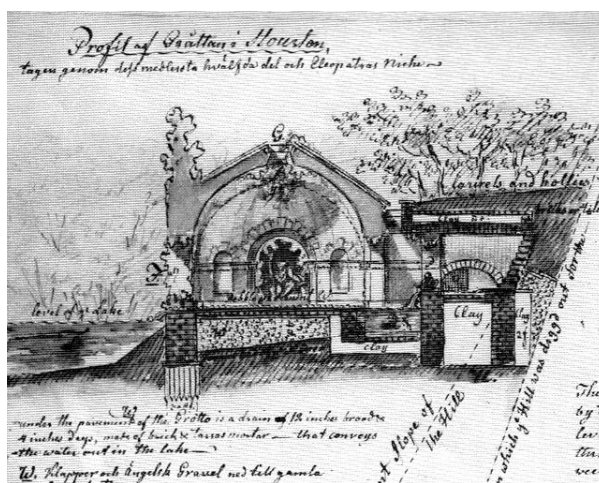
Section of Stourhead Grotto, Wiltshire, England. Drawing by F. M. Piper, 1779 (Woodbridge 1971, Figure 12b)
